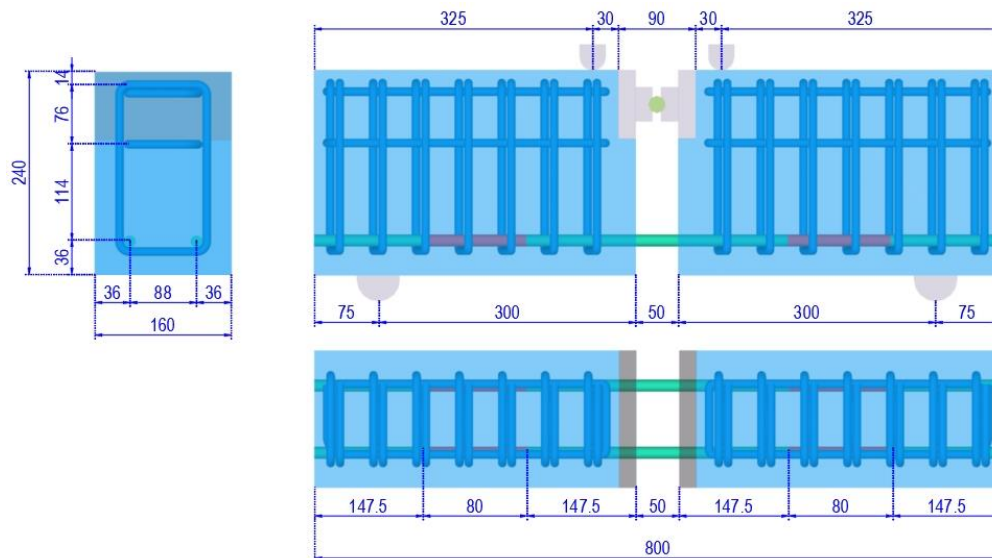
Reinforcement details of un-splice hinged beam and dimensions.
